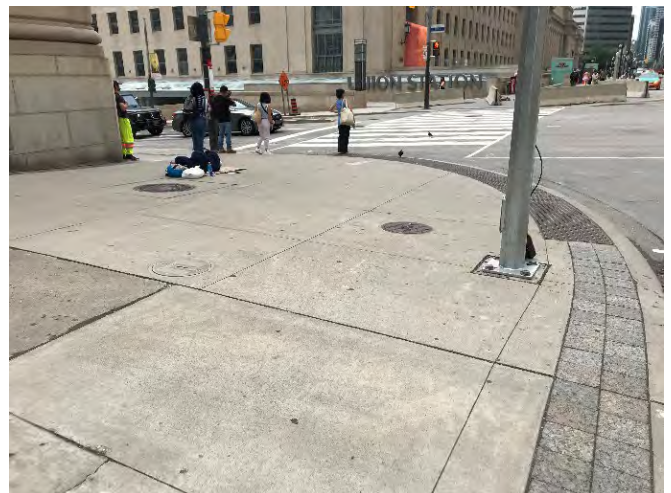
View of the southeast corner of Bay Street and Front Street West facing west. Note the large concrete paving stones that are accented by decorative paving stone inlay along the curb.
